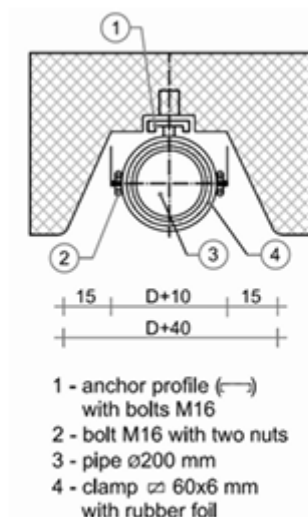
Leading of vertical drainage pipe in a groove in the pier structure
